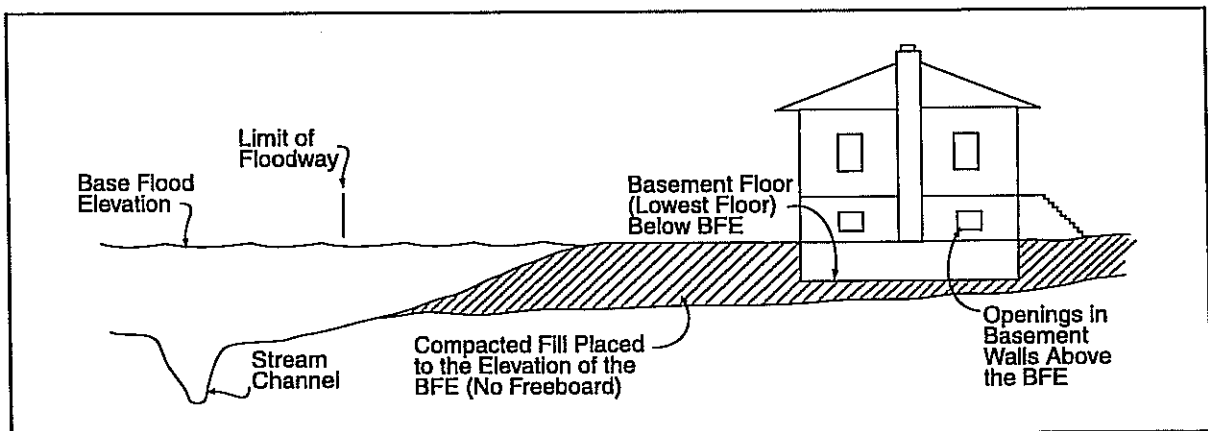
Basement foundation with lowest opening above the BFE. Surface flooding is less likely to enter and inundate the basement.
